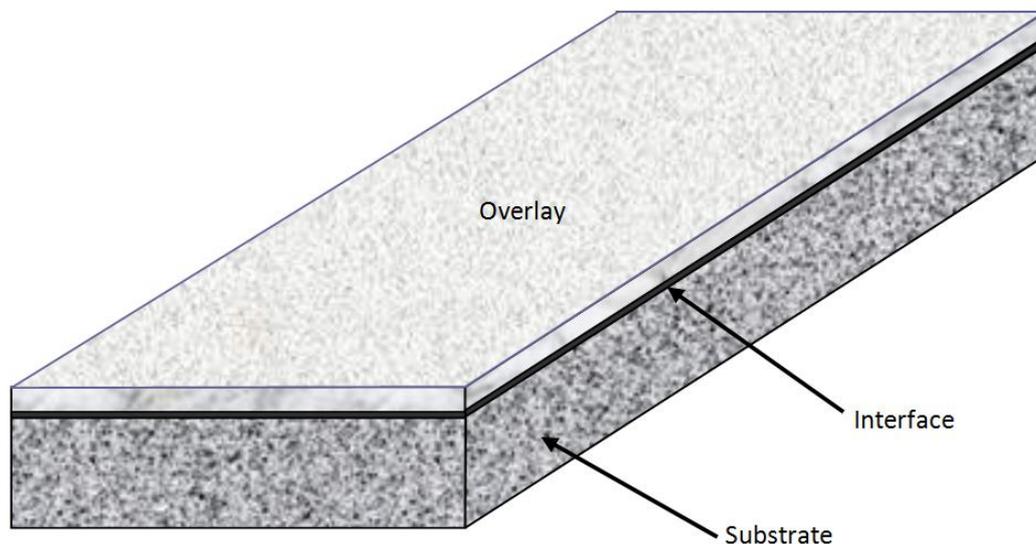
Bonded concrete overlay (Masuku, 2009)
